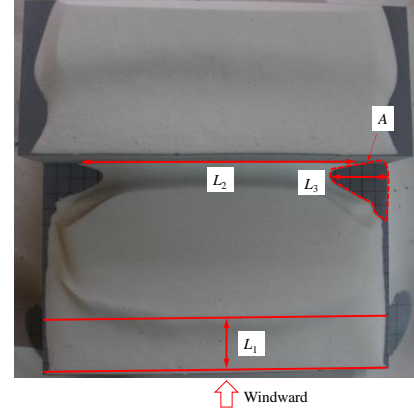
Typical 3D snowdrift on the stepped flat roof in wind tunnel test
